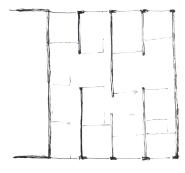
Diagrammatic sketch of regular floor plan showing parallel loadbearing walls.
